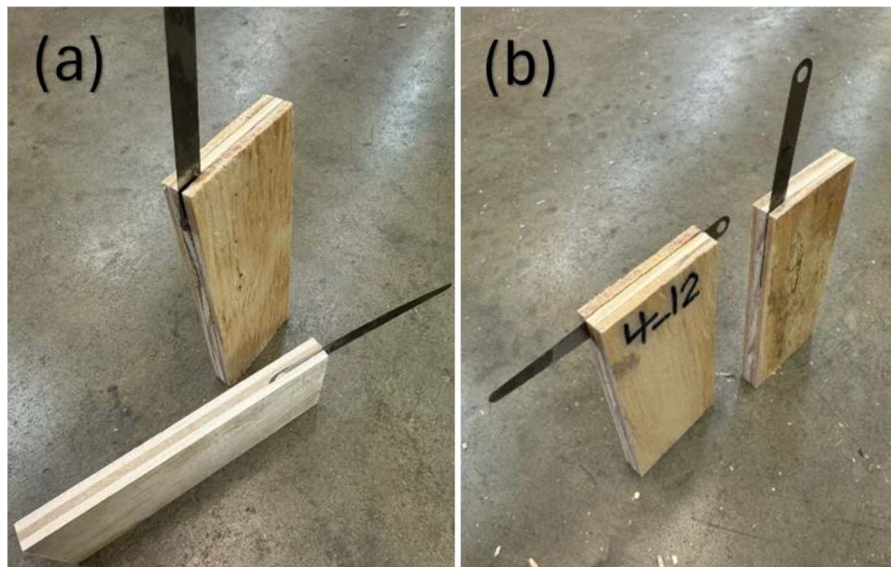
Specimens evaluated using a feeler gauge. (a) Passed the test with minor cracks and (b) failed because of having long and wide cracks.
